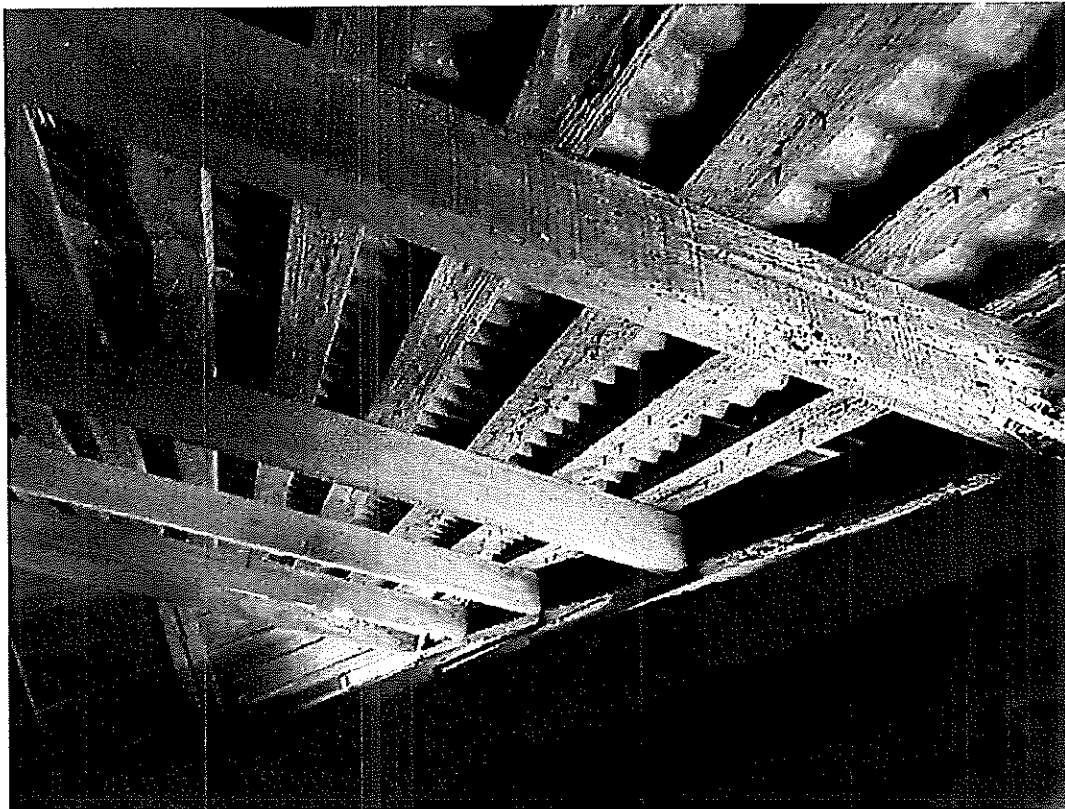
rafter and purlin damage and a non-existent load path from the roof to the exterior walls
